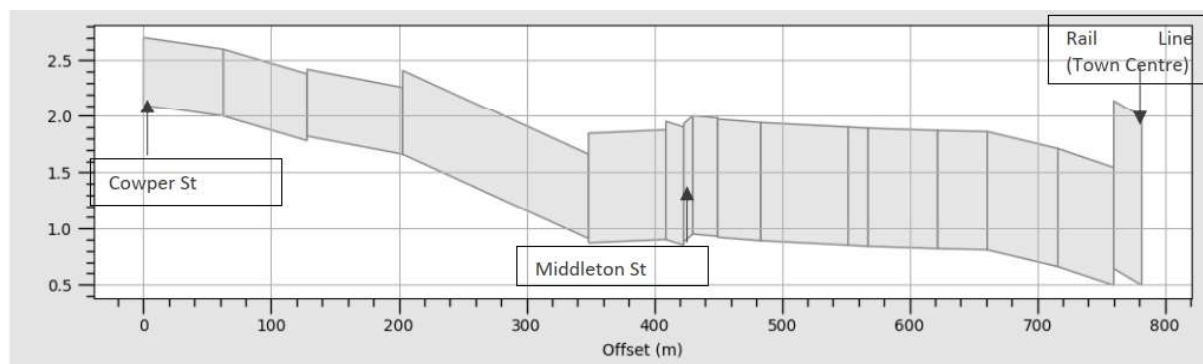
| Existing drainage longitudinal section from the Cowper Street chamber to the town centre outlet
